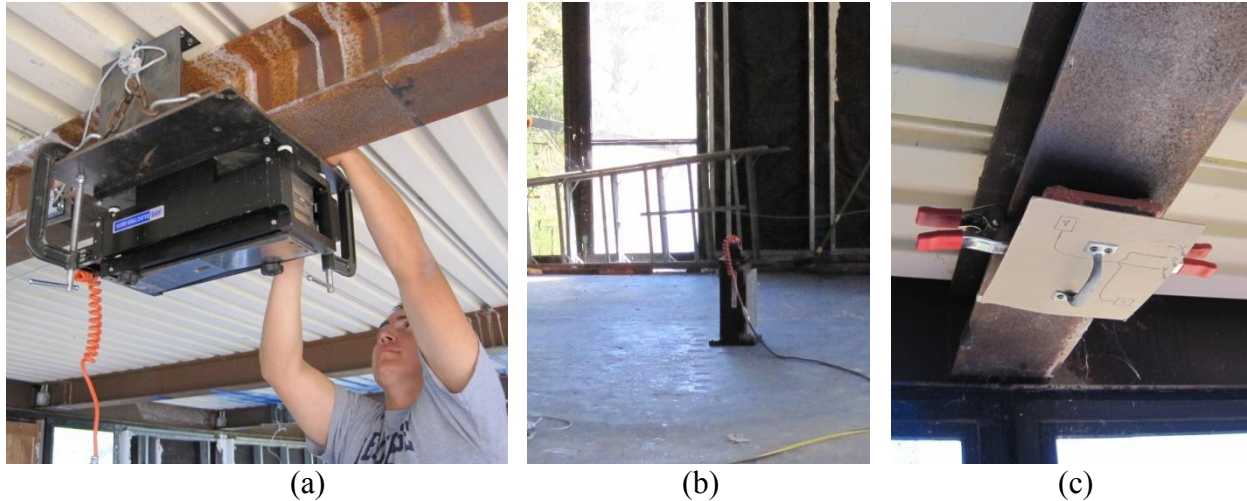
Student Setup of (a) Roof Mounted Horizontal Shaker; (b) Floor Mounted Vertical Shaker; (c) Roof Mounted Accelerometers
